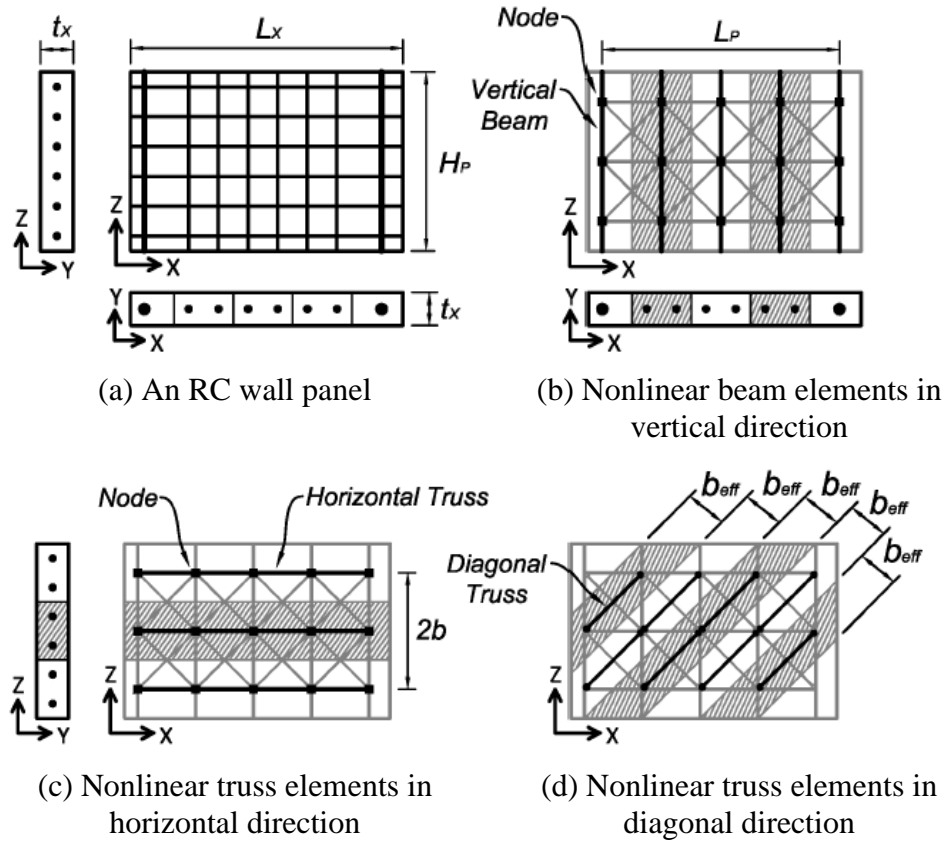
A beam-truss model for RC shear walls (Lu and Panagiotou, 2014)
